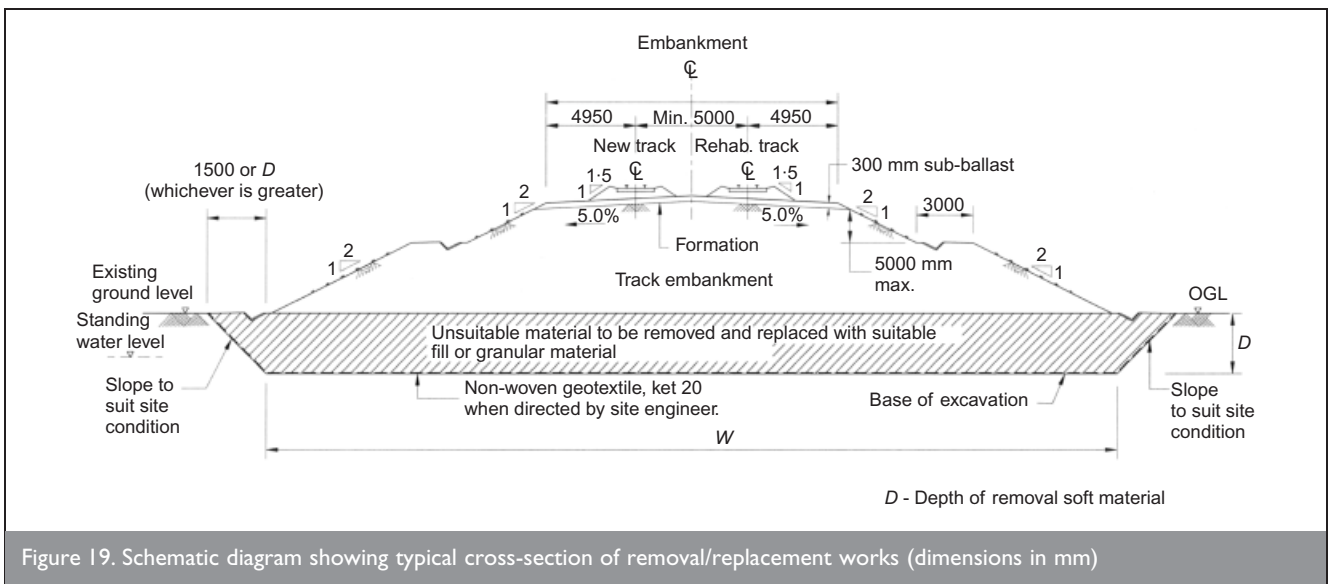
Schematic diagram showing typical cross-section of removal/replacement works (dimensions in mm)
